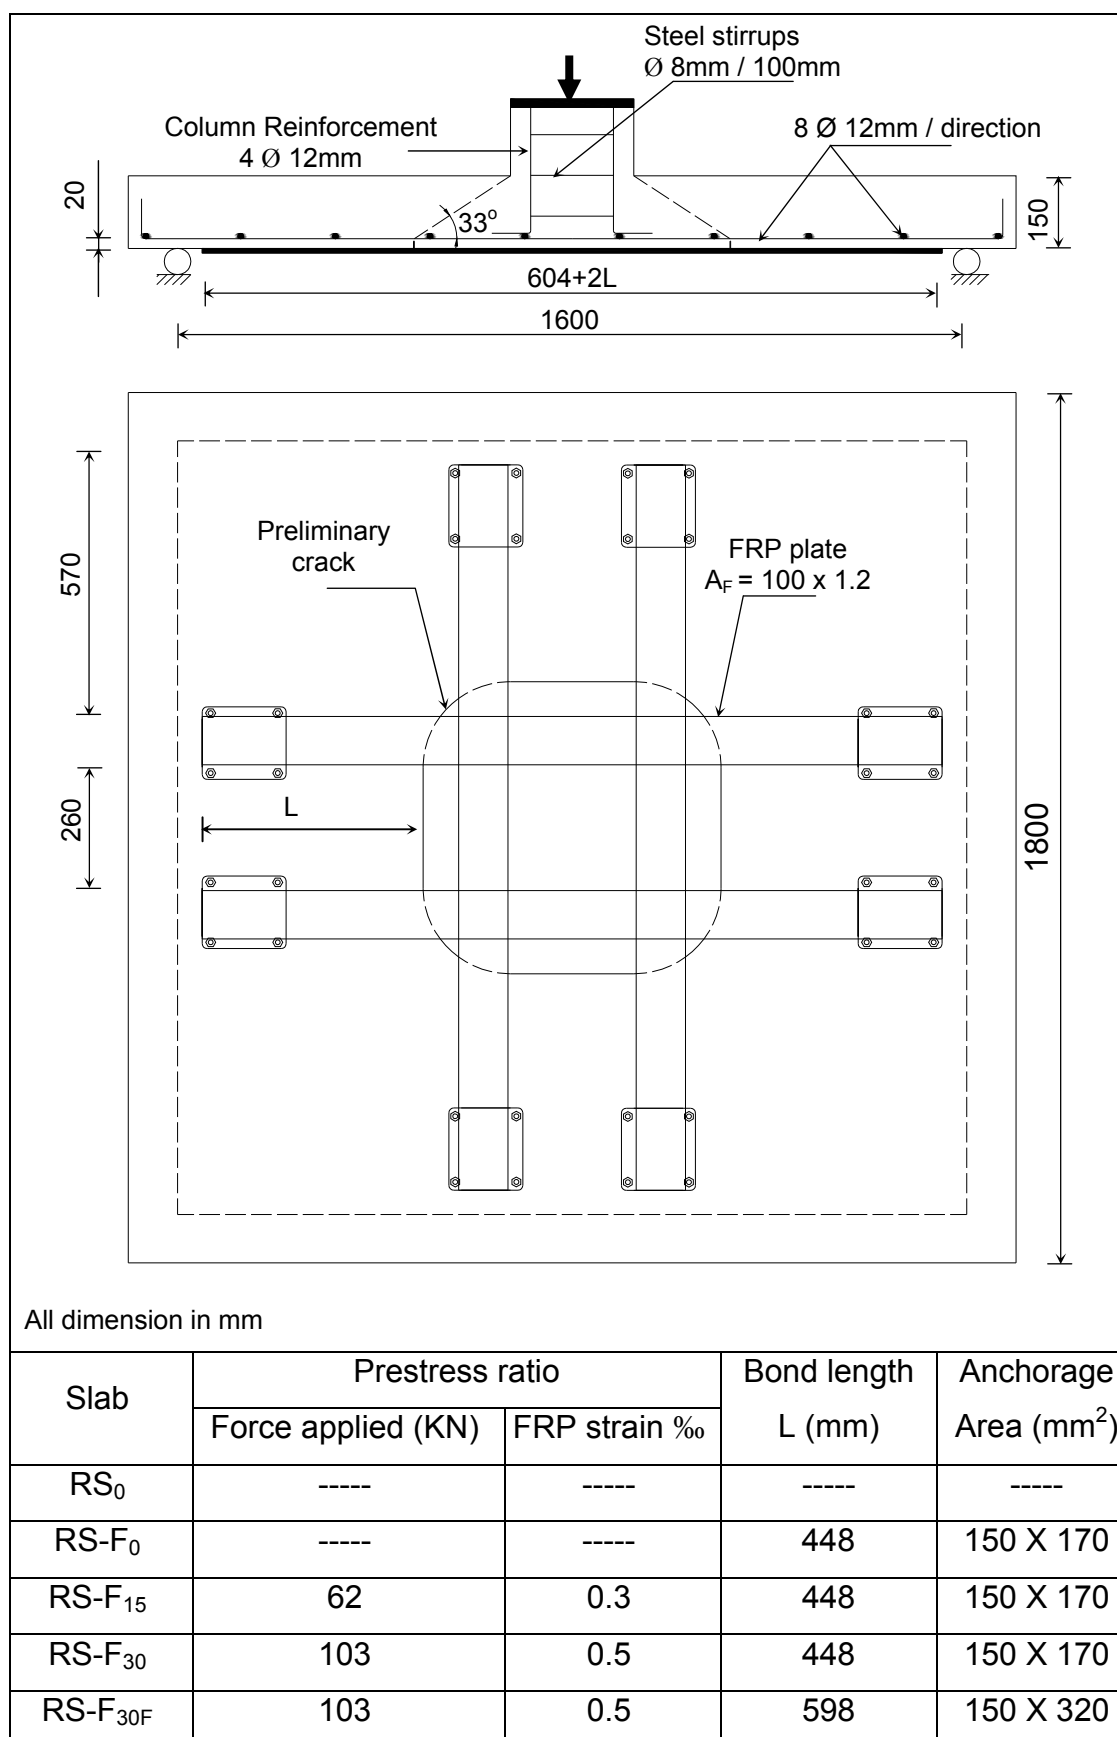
Layout, and geometric and reinforcement details of test slabs.
